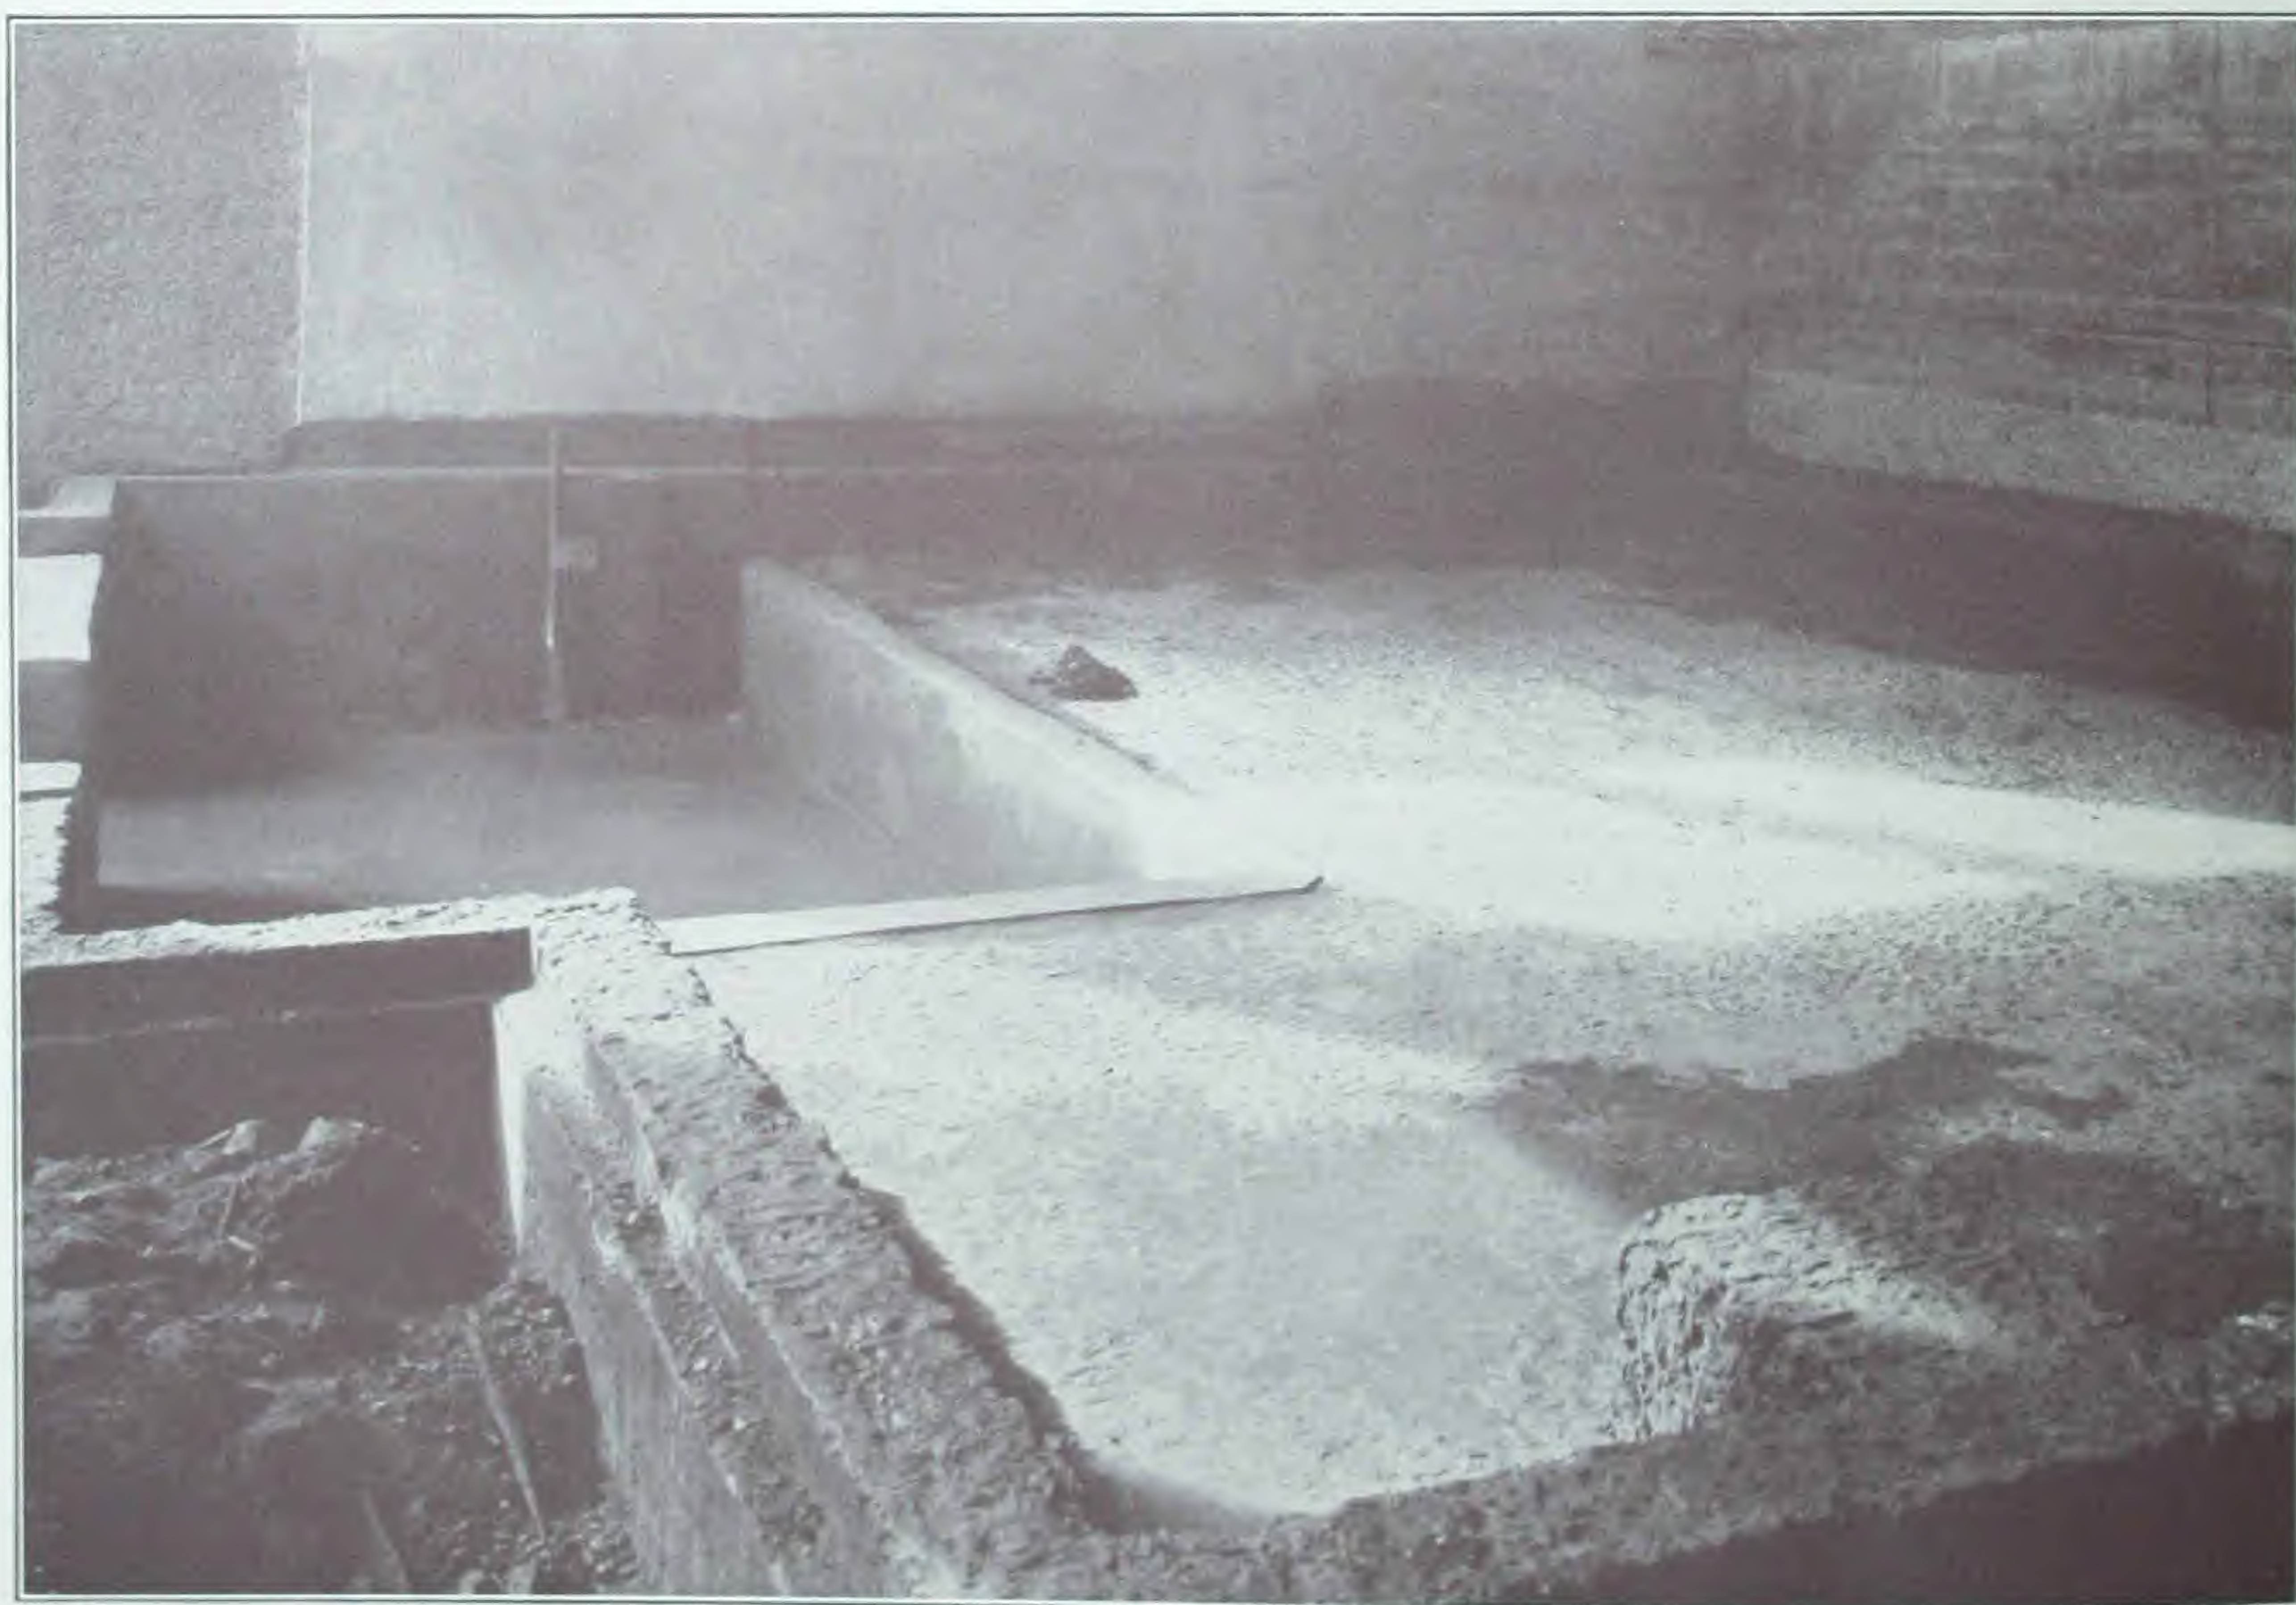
Typical View Showing Waterproofing Work in Progress.
